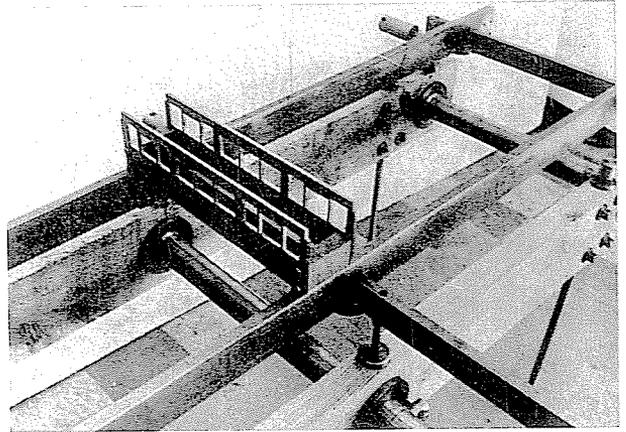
Manufacturing apparatus for floor elements: longitudinal frame and cross-combs
